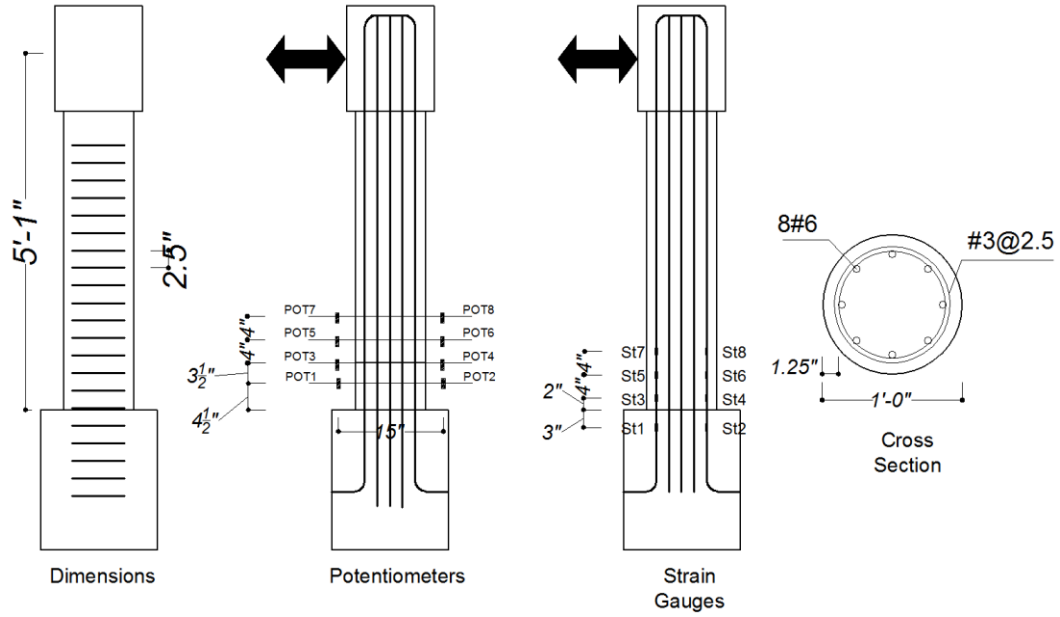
Specimen S-6-R details, dimensions, reinforcement and installed measurement tools.
